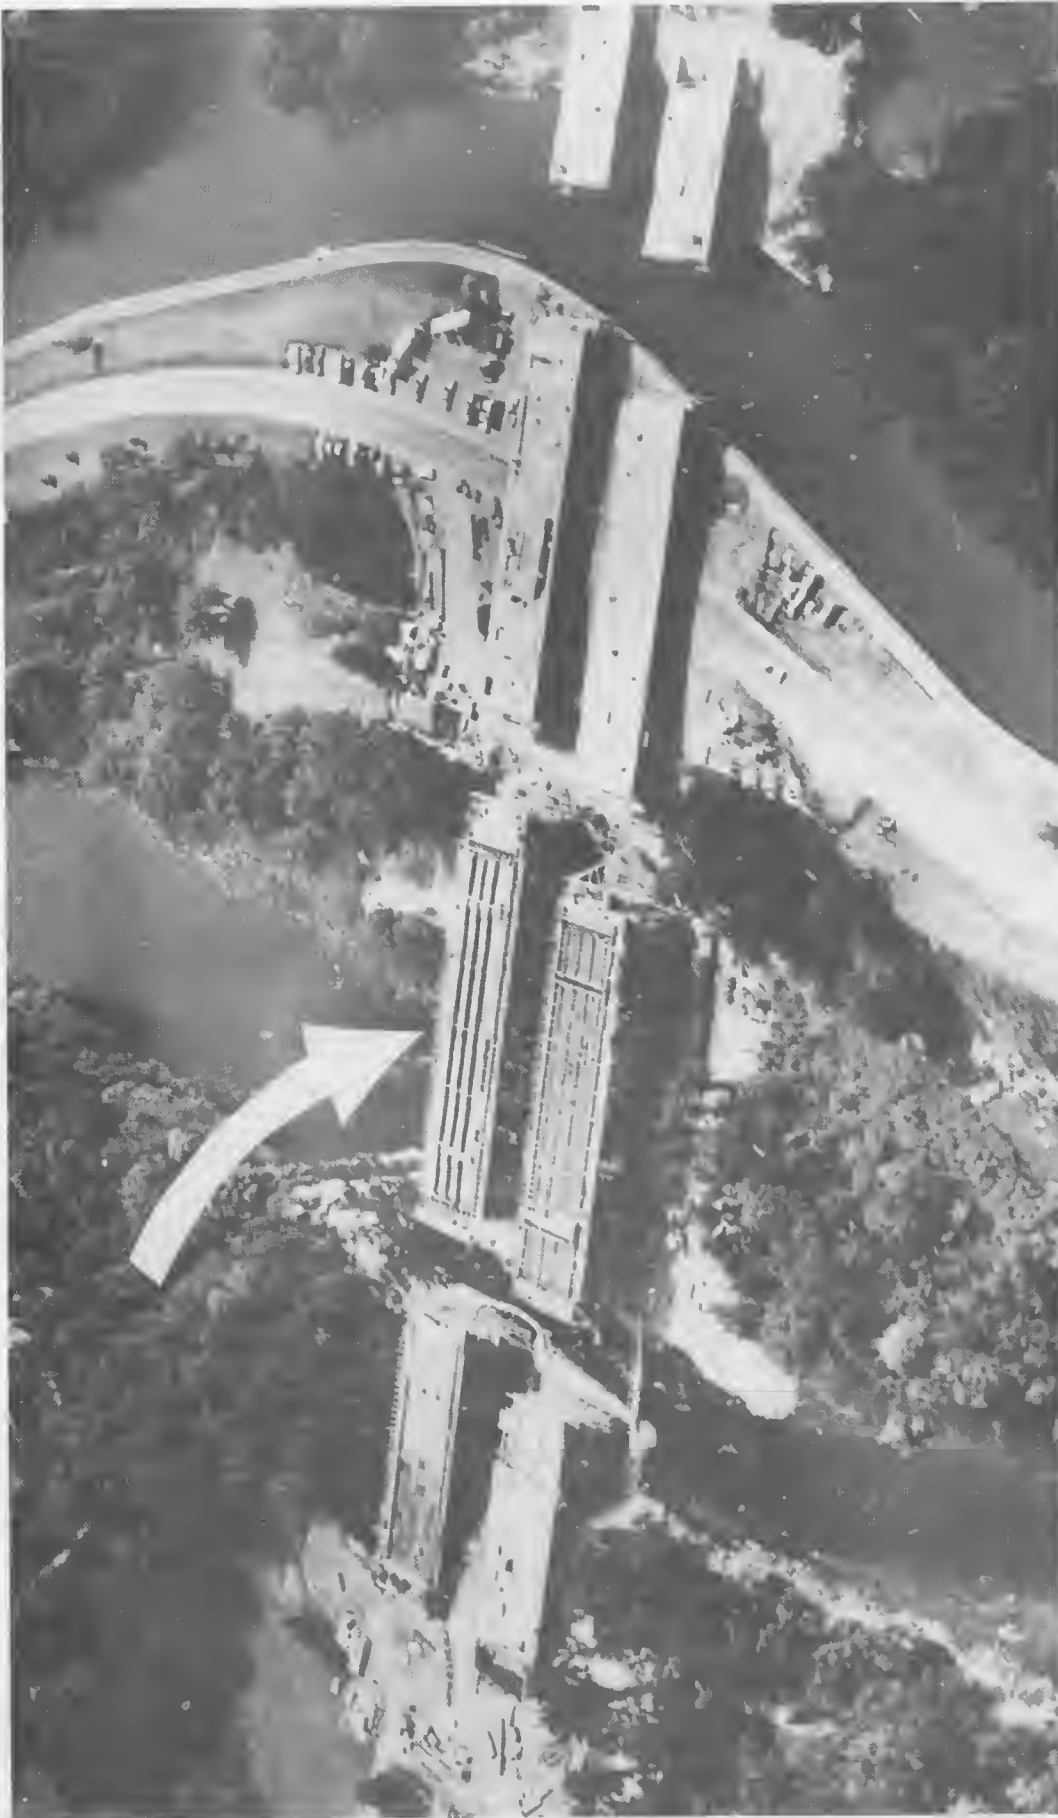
Heron Road Bridge before the Collapse (from U.P.I.)
